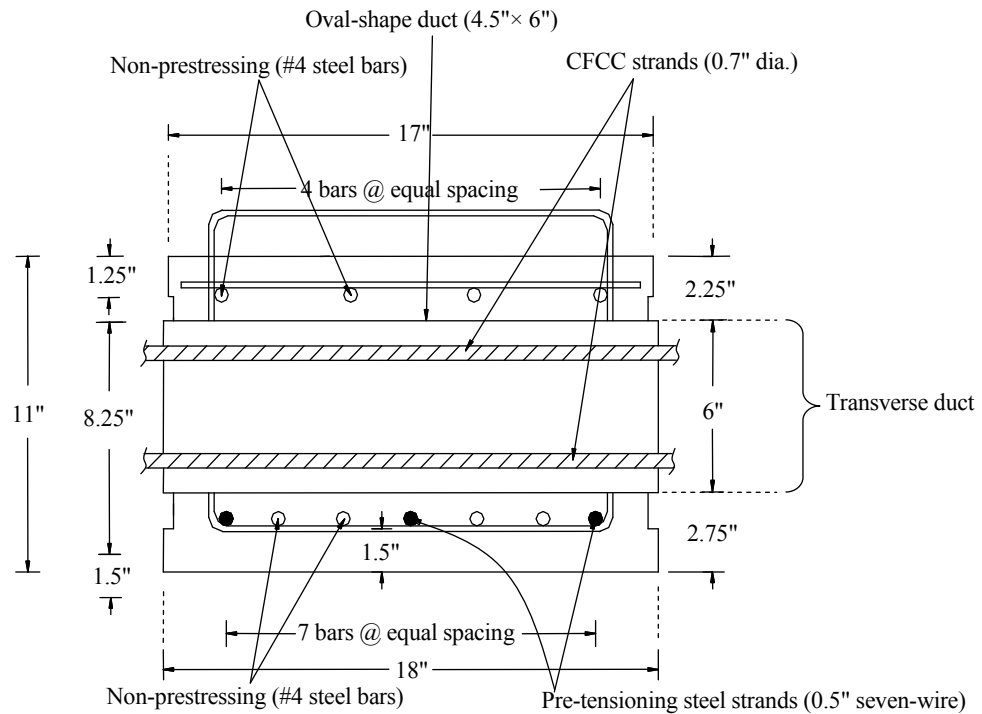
Cross-sectional details of the box-beams at diaphragms.
